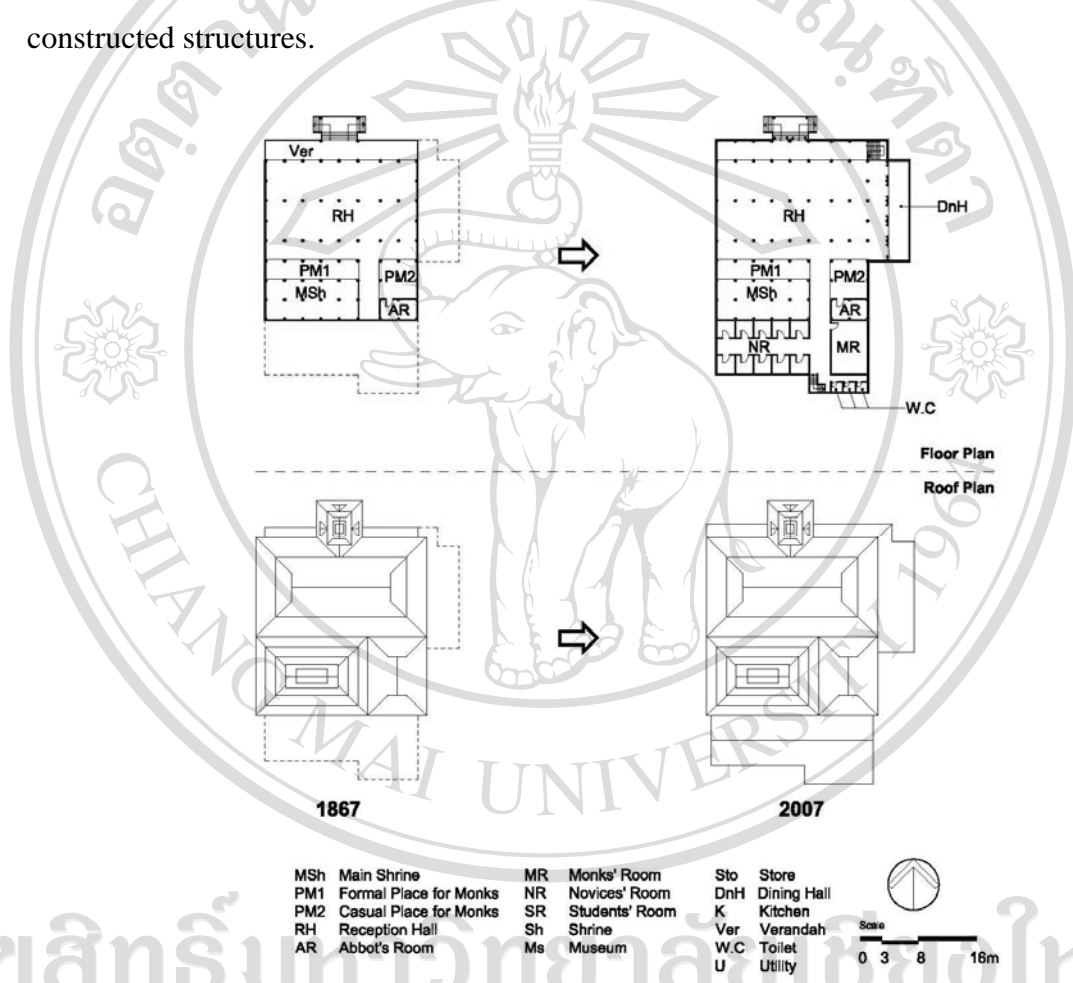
Spatial Transformation in Main Monastery Building of Wat Muang Pon
